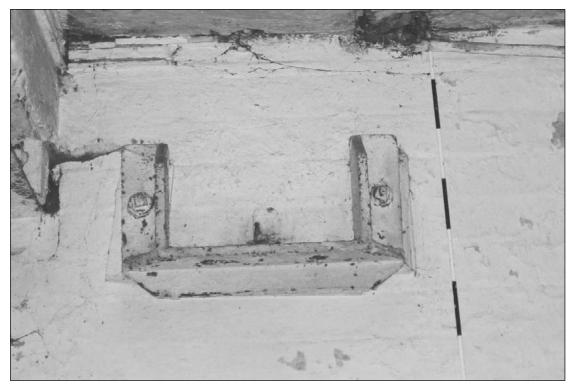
Detail of cast iron fitting, south wall of G6 (film 42.24)
